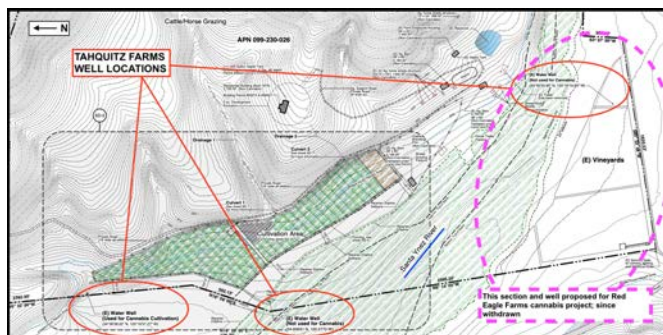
Location of water wells from Tahquitz Farms's site plans.
